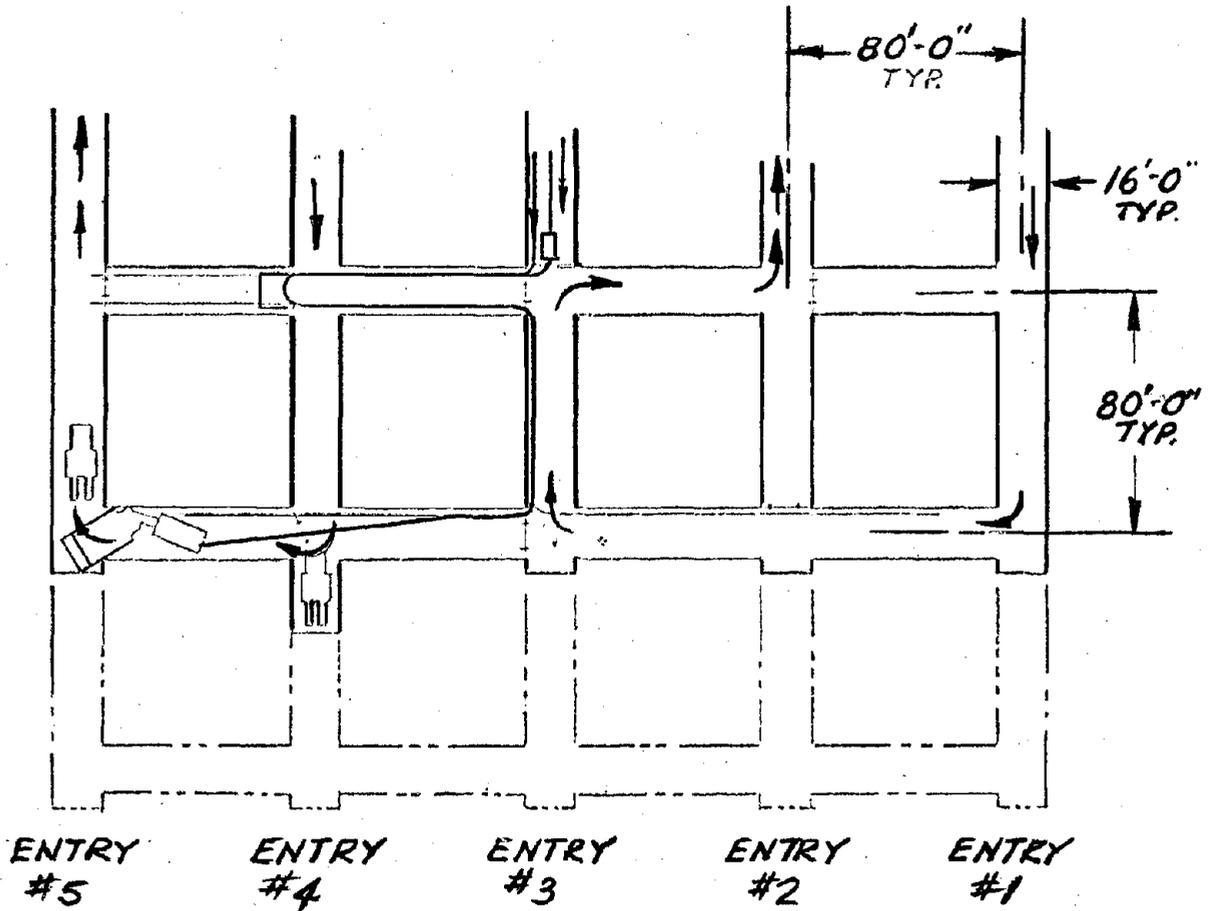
Mine Plan; First Cut in Entry No. 5
